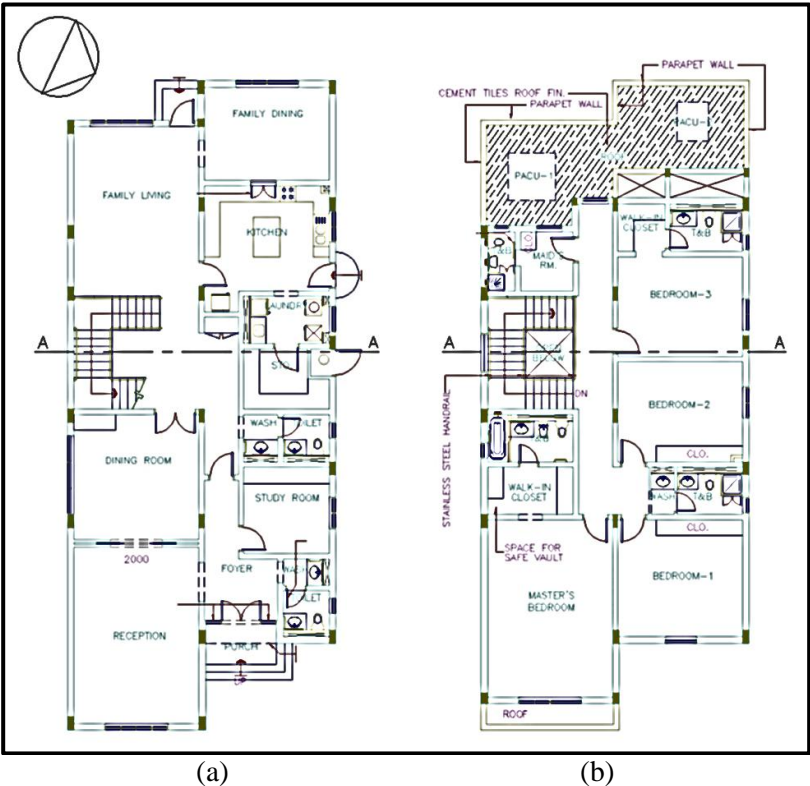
Building Floor Plans; (a) Ground Floor, (b) First Floor (Projects Department, KFUPM)
